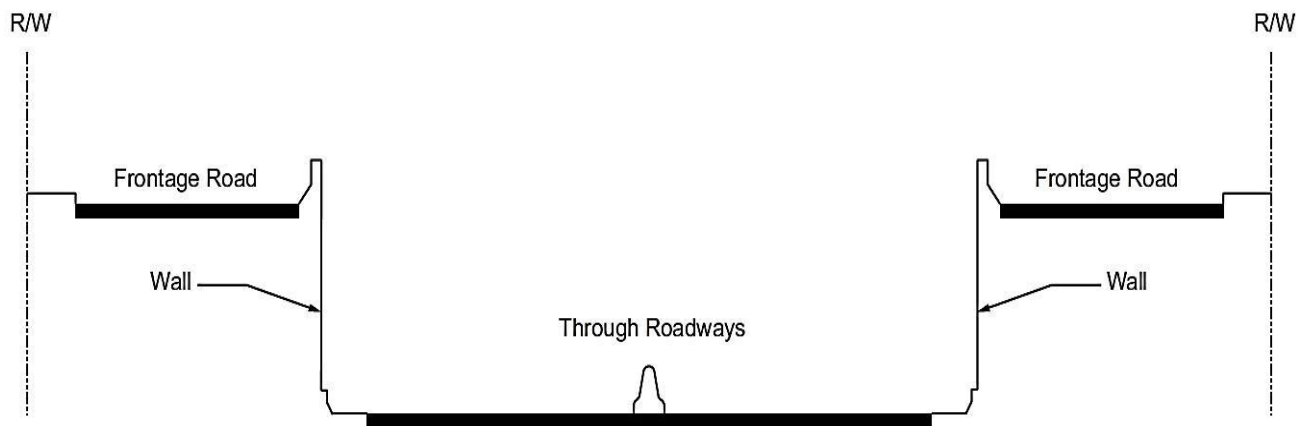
/3: Cross Section with Retaining Walls on Depressed Freeways without Ramps [1, p.8-14]
